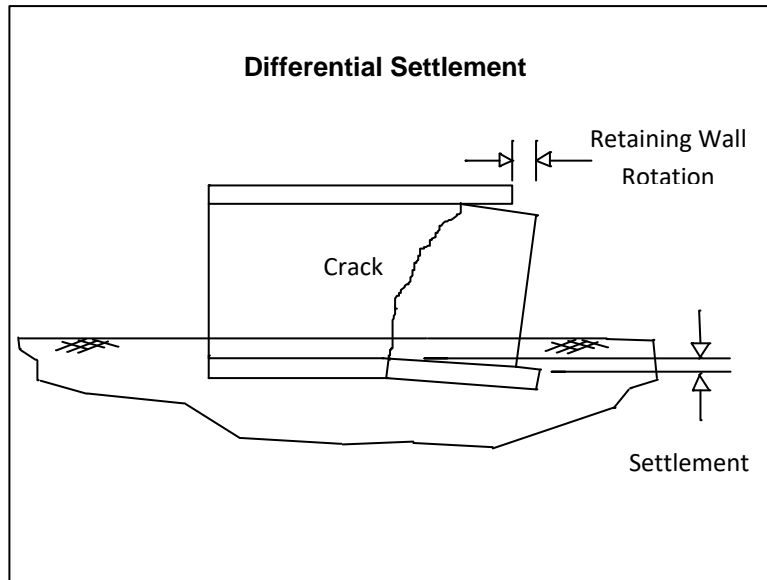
Differential Settlement Under a Retaining Wall.
